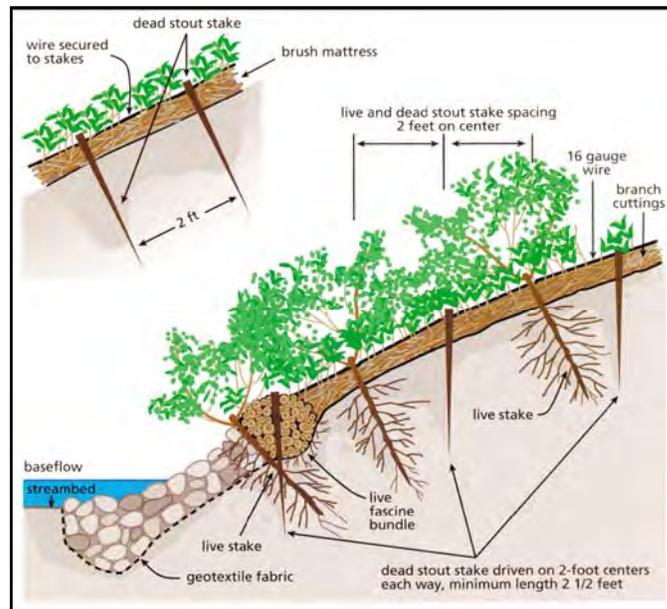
Details of Brush Mattress Technique With Stone Toe Protection
